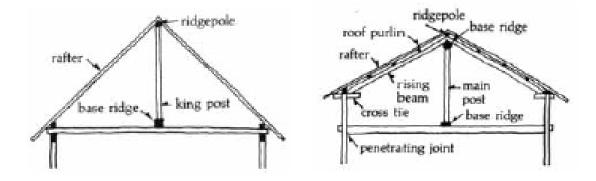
King post truss (Shintsuka-gumi) (left) and rising beam truss (Noboribari-gumi) (right) (Source: Piccinini, 2003)
